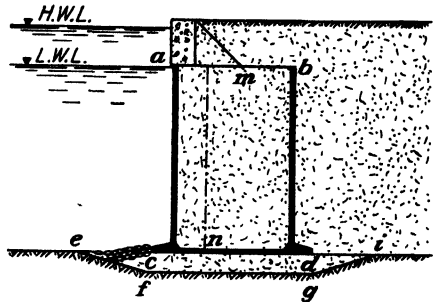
Cellular reinforced-concrete caisson type of quay wall.
